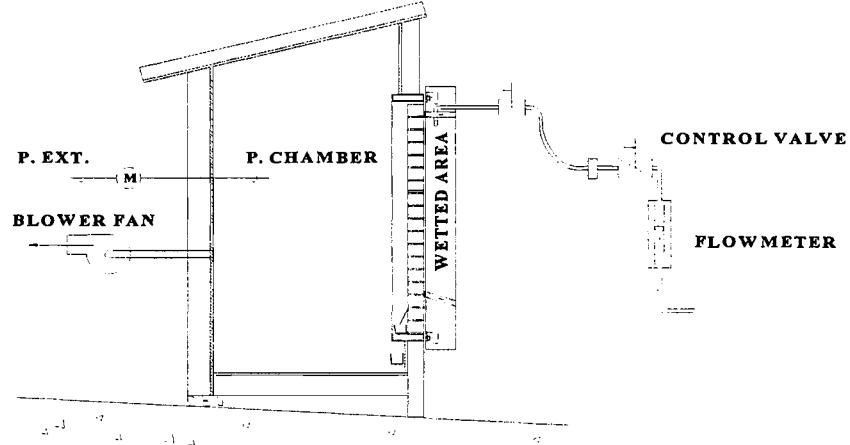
MODIFIED ASTM E-514 TEST APPARATUS
